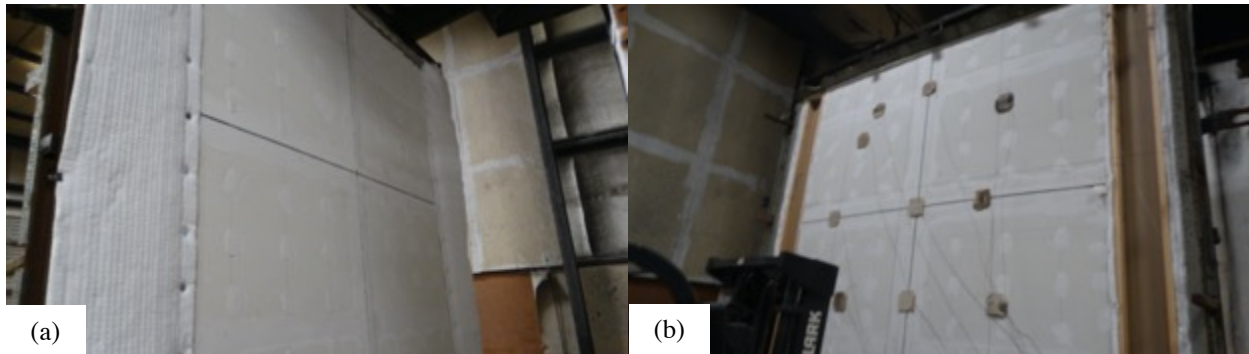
Overall assembly showing (a) exposed face and (b) unexposed face.
